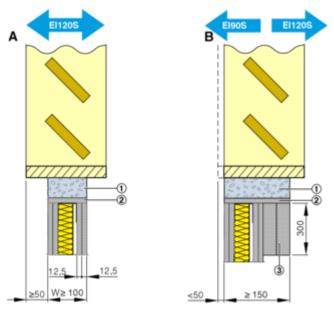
EK-JZ Installation centred or flush on one side (overhang <50 mm)
